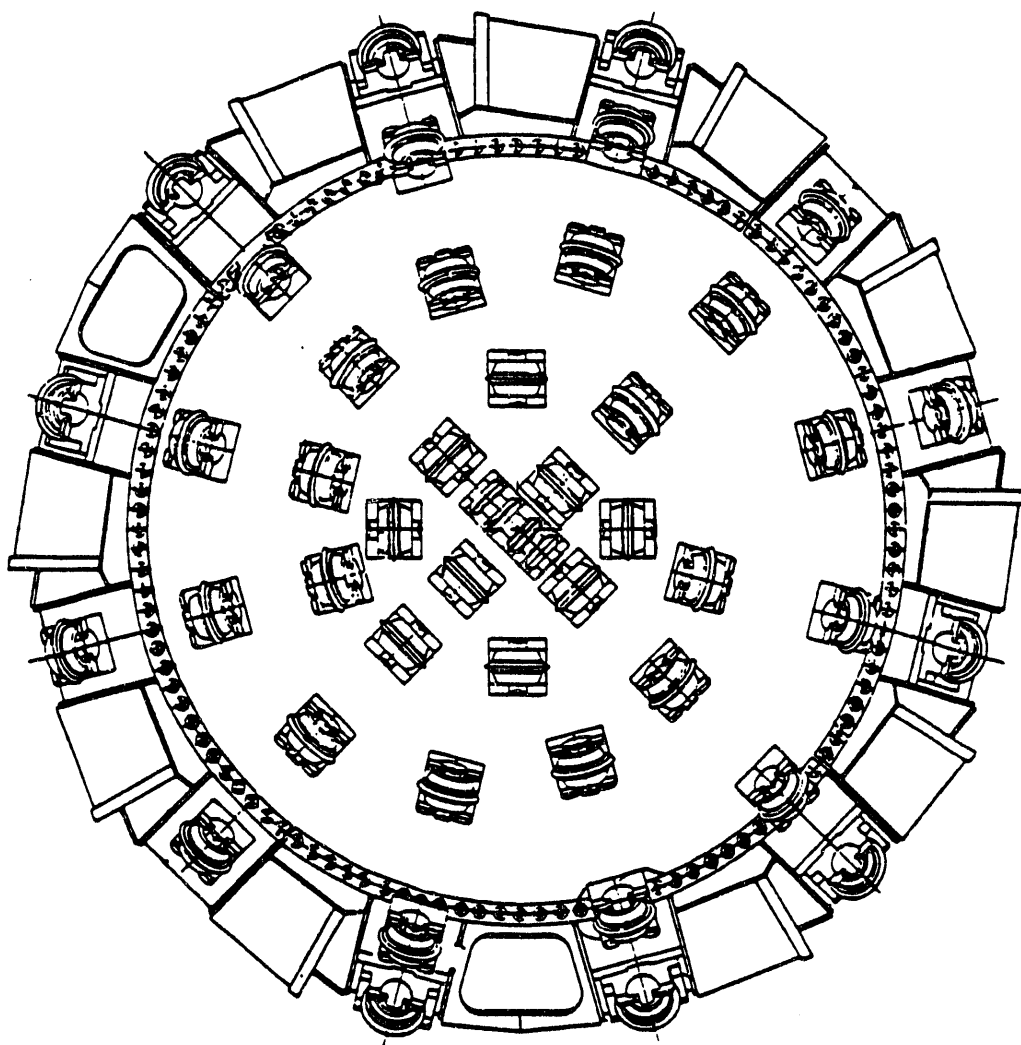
Head-on View of a TBM Cutterhead Mounted With Disk Cutters
